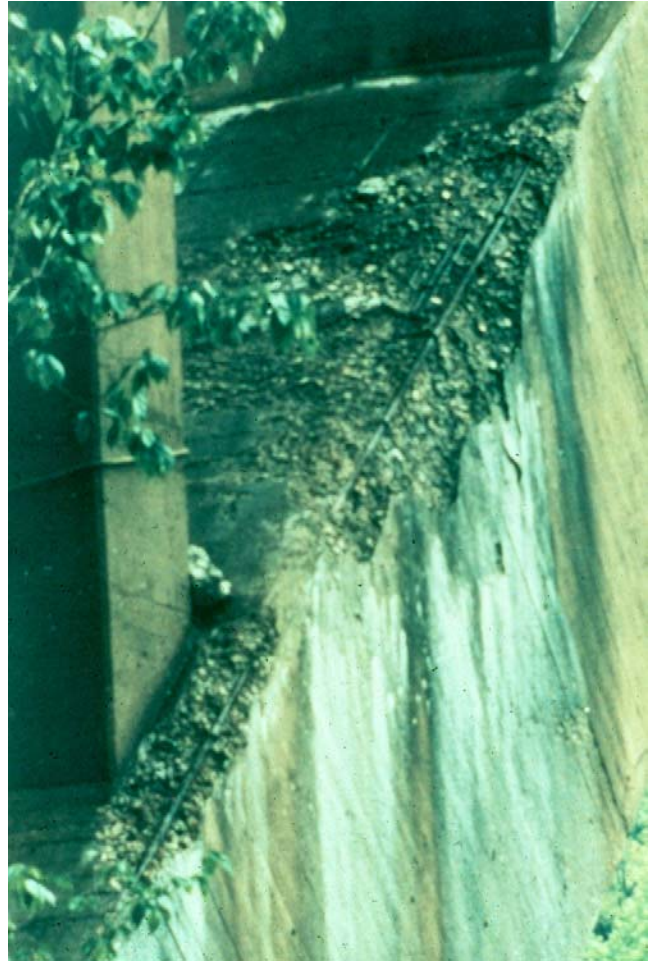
Scaling and Contamination on an Arch Rib Due to a Failed Drainage System
